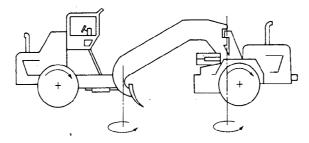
FOUR WHEEL, DOUBLE ARTICULATED STEER, FOUR-WHEEL DRIVE
